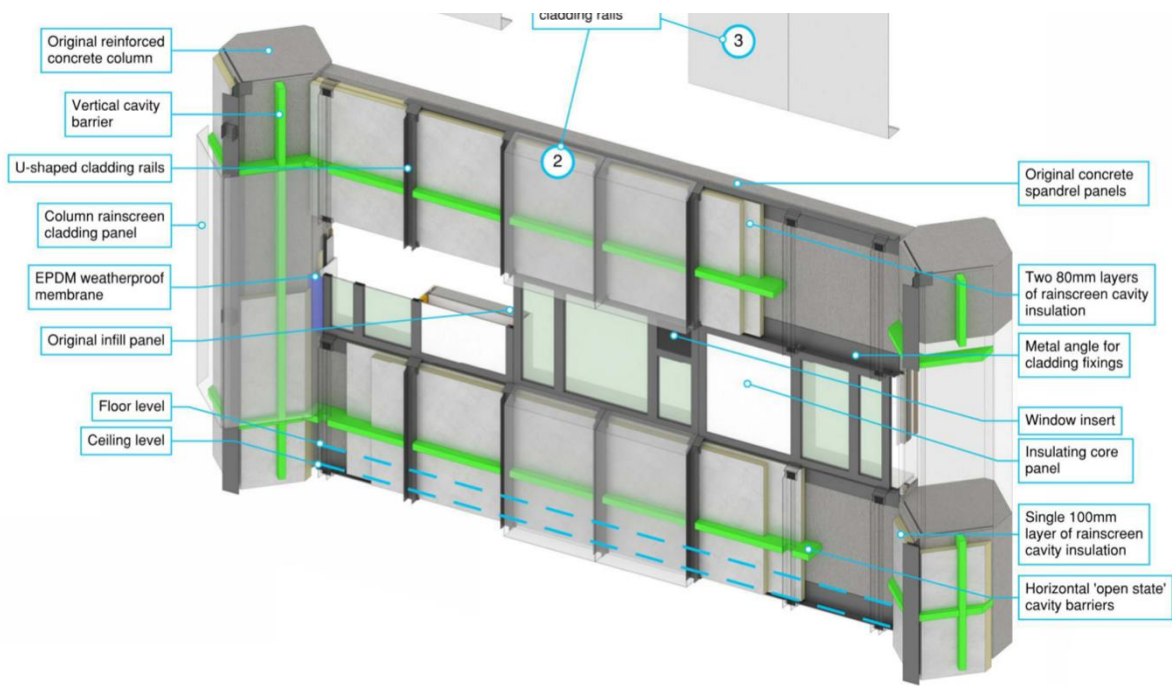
Render of external wall construction after completion of the refurbishment works
